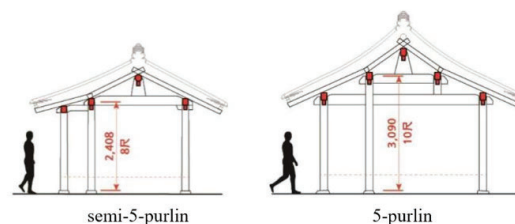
Column heights and roof types applied to the major reconstructed buildings.
